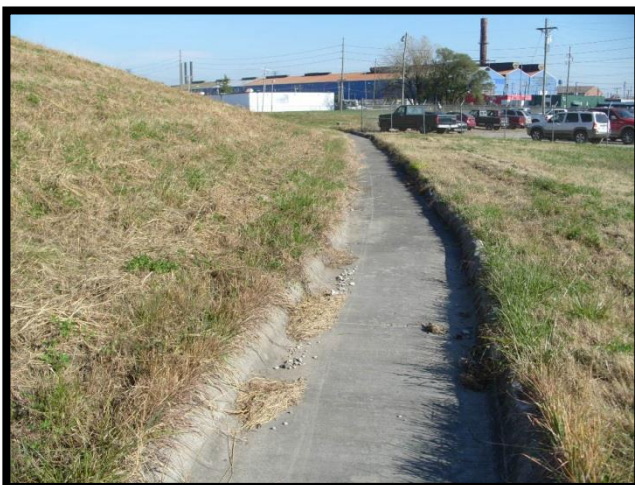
Fence and concrete drainage swale (southwestern side of Taracorp pile cap).
